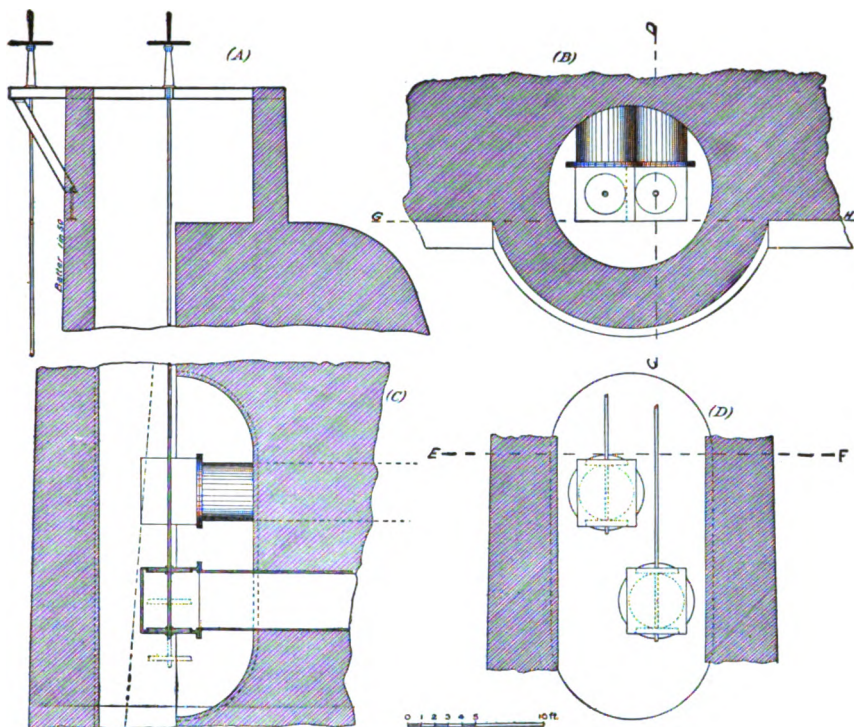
DETAILS OF OUTLET TOWER AND GATES, SAN CARLOS DAM, GILA RIVER, ARIZONA.
